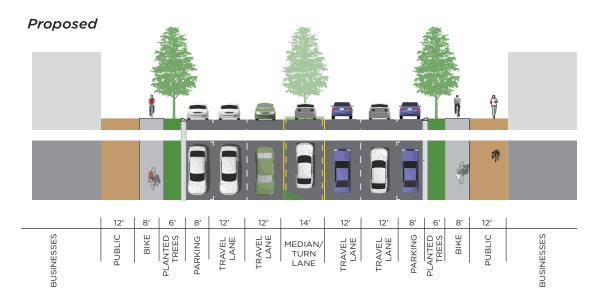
Cross-sections of Main Street at Laurel Mountain Road and at constrained landscape area west of Center Street
